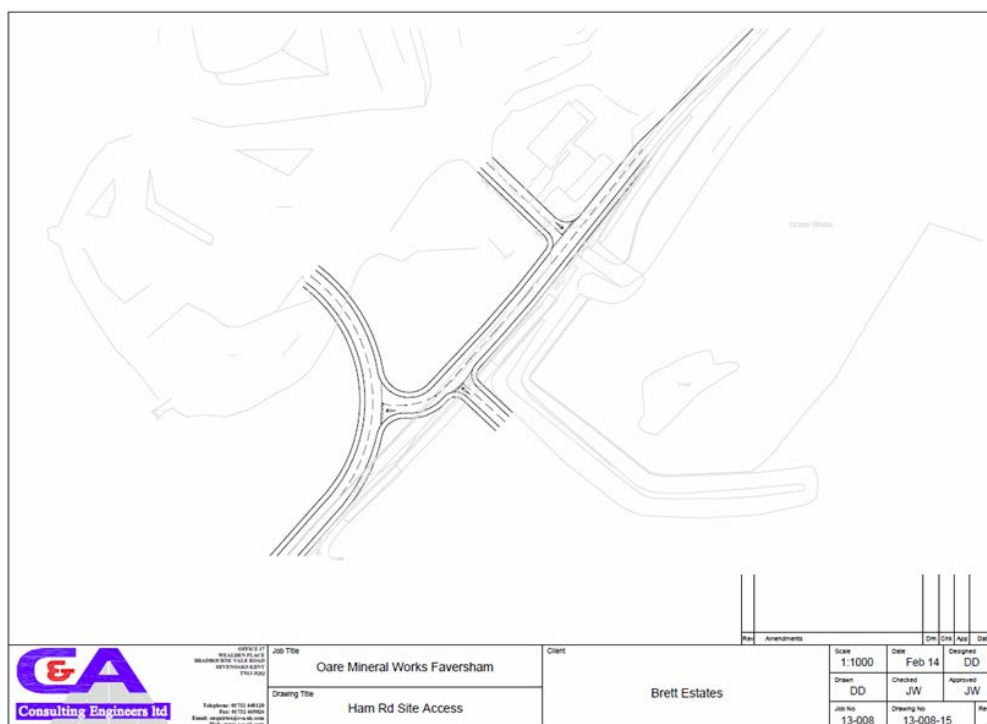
Proposed detailed site access submitted with the Oare gravel works application which provides access to the proposed GBH Wheler Will Trust Site.
